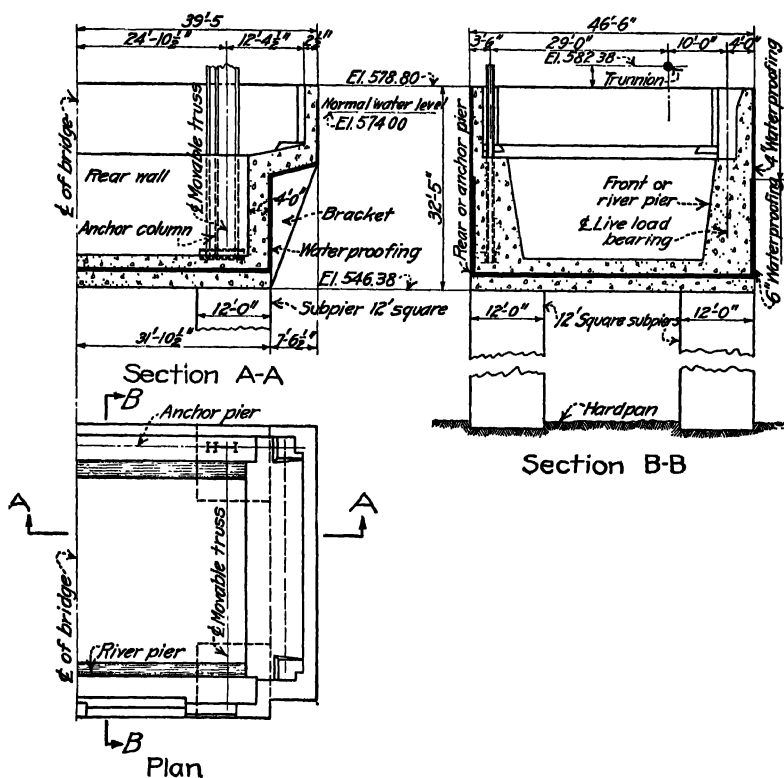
General design of Jefferson Avenue and Fort St. Bridge, Detroit; also the new railroad bridge for the Detroit, Toledo & Ironton R. R. over the Short Cut Canal at Detroit; also all the late bridges in Chicago.
